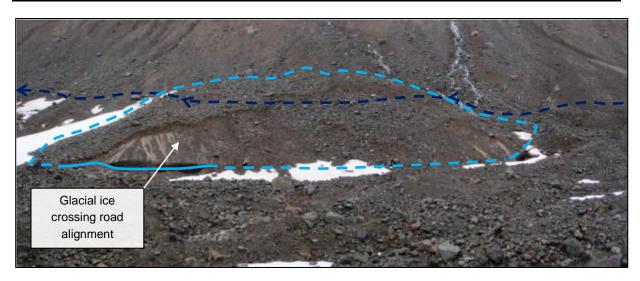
Tunnel Adit and Tunnel Adit Spur Access Roads – Looking downchain (southwest) from Treaty Creek access road towards the Tunnel Adit and Tunnel Adit Spur access roads.
